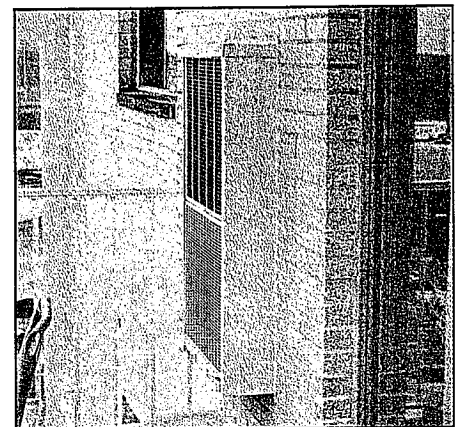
Unit located near reinforced door or window opening and through brick-veneer wall reduces likelihood of vibration excitement of wall in wood-frame construction.
